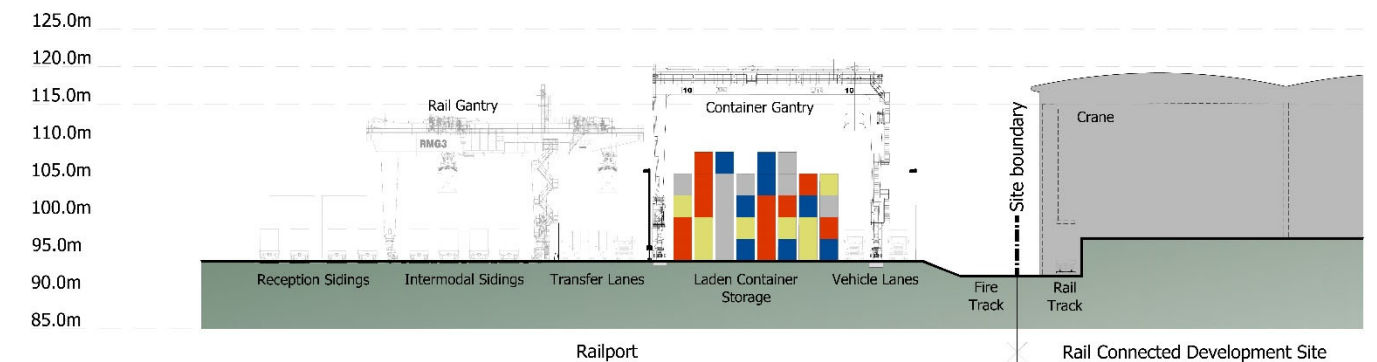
Key plan to be read in conjunction with Fig 56. Section A
